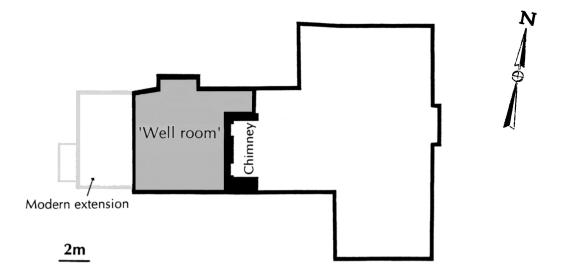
Hyde Farm: outline plan of ground floor showing 'Well room', brick chimney and area of modern extension
